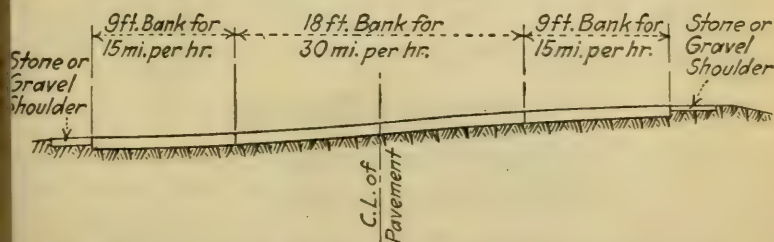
Variable bank pavement section 4 lines of traffic.
